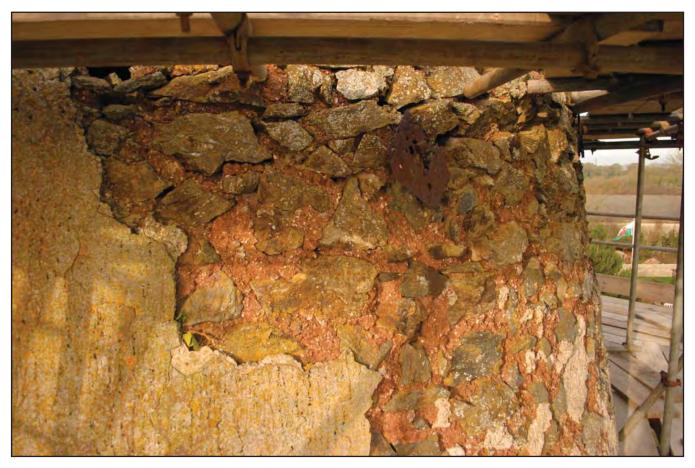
Detailed shot showing original lime render & metal tie plate on the 2nd floor. Photograph taken from the south west
